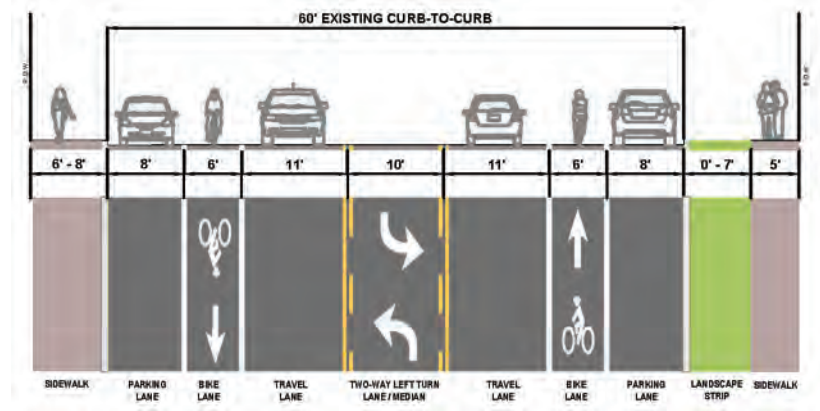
Industrial Road Existing Typical Section E (Facing North)
